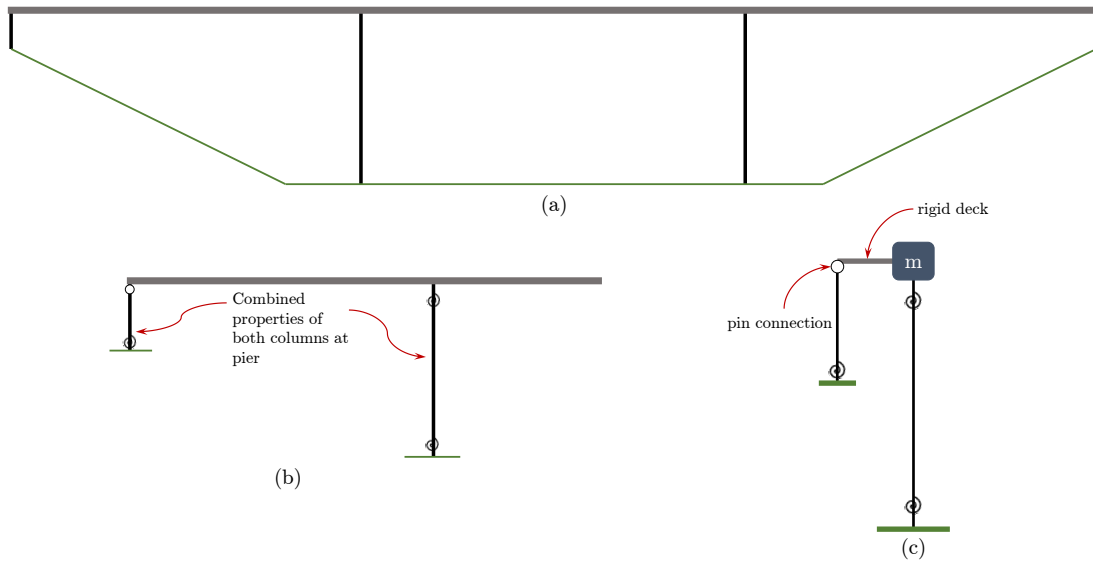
(a) idealization of Bridge 3, (b) reduction to essential sections, and (c) model
